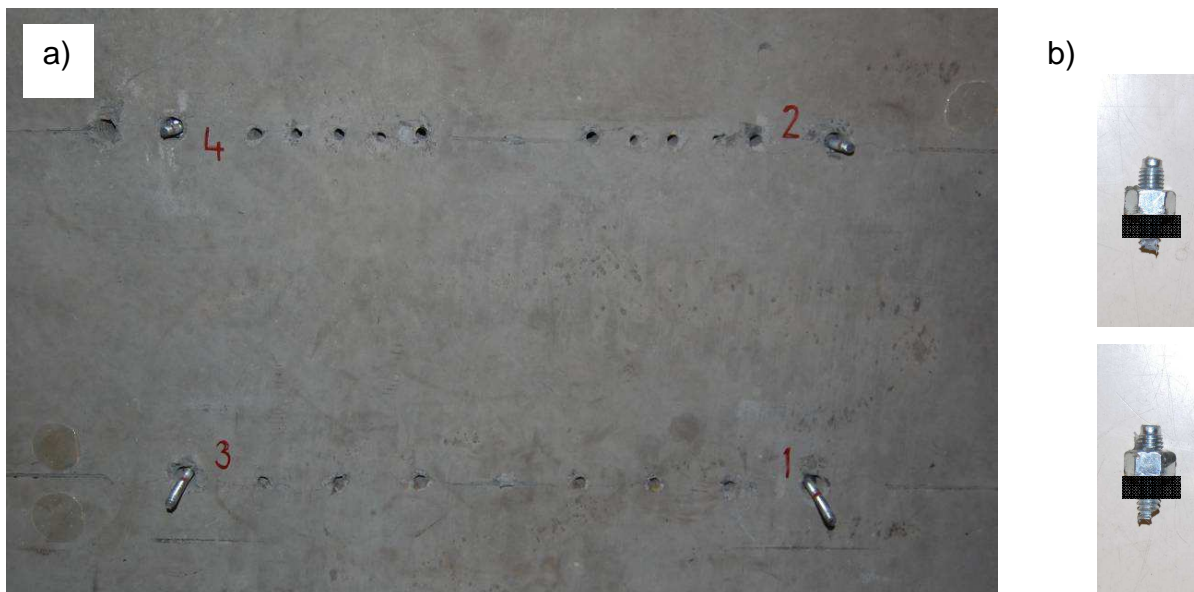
a) Failure photograph of the 130 % test run on the UC1 anchor;
